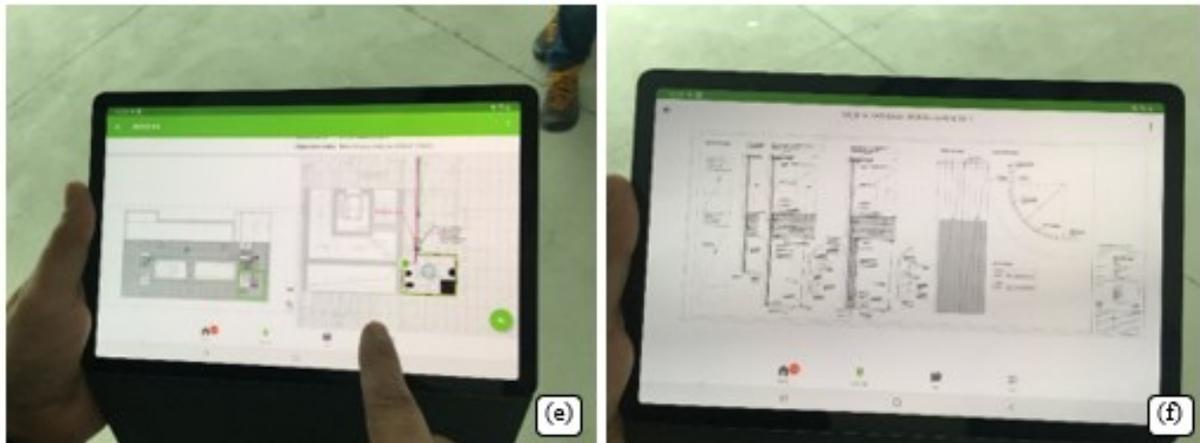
Checking specific information (e), accessing construction details (f). (by author)
